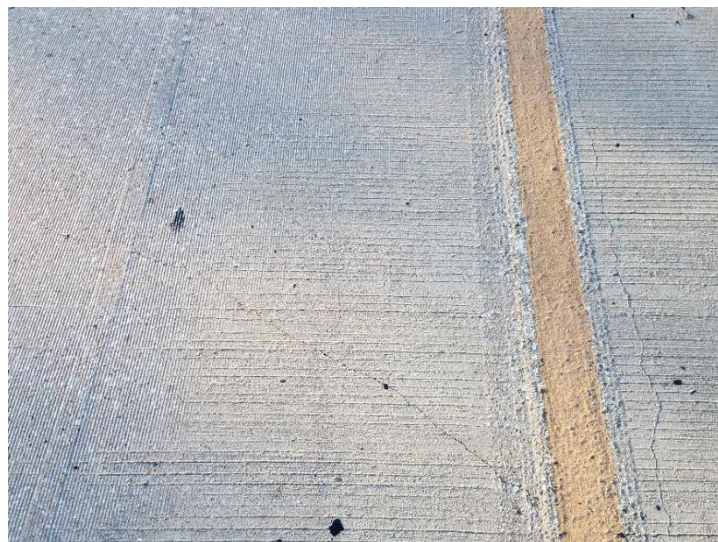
Longitudinal and diagonal deck cracks on bridge S034 31644.
